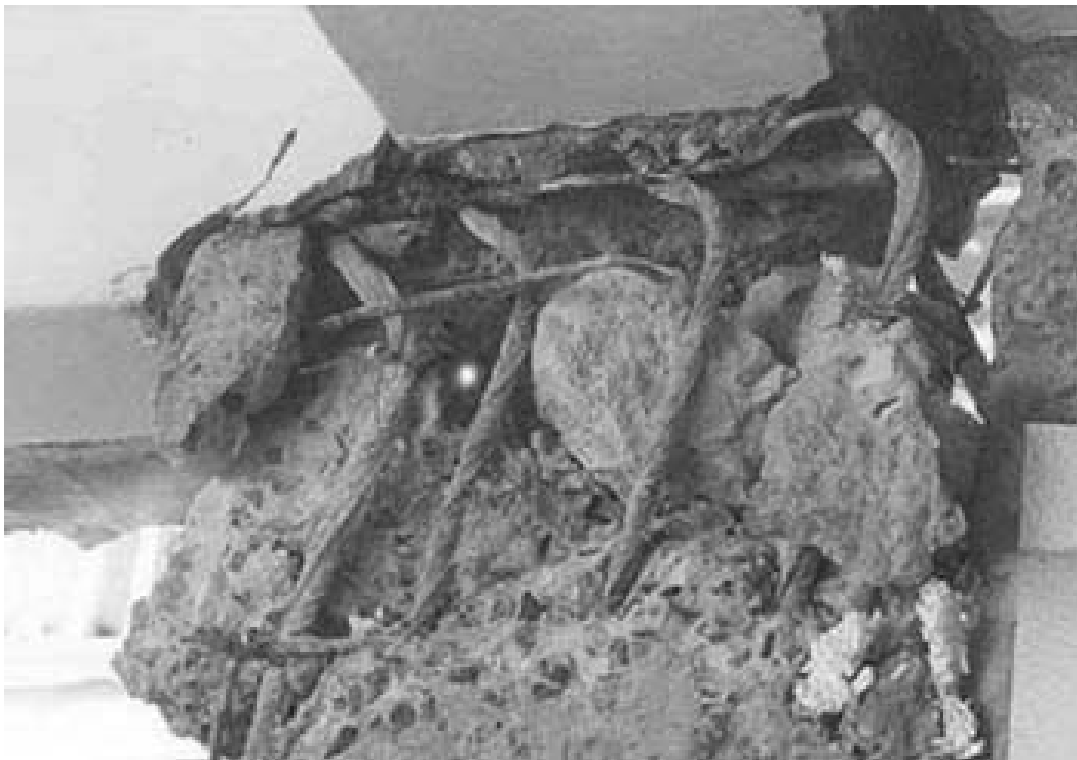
Heavy compressive stresses with large deformations causing total destruction of column head with heavily bent main bars. Concrete not contained by links because they were too far apart.
